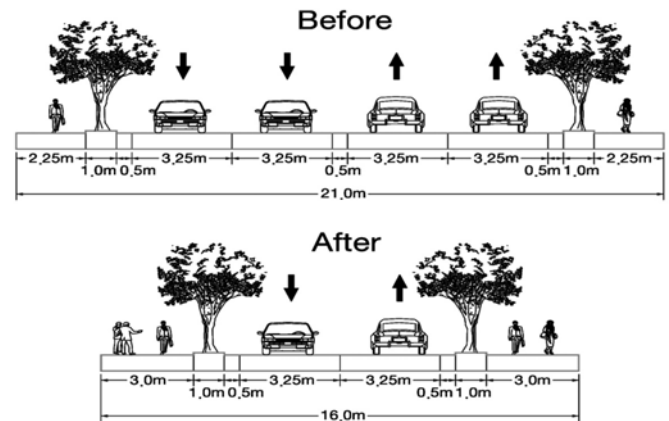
Proposed Street Cross Section and the Existing Cross Section
